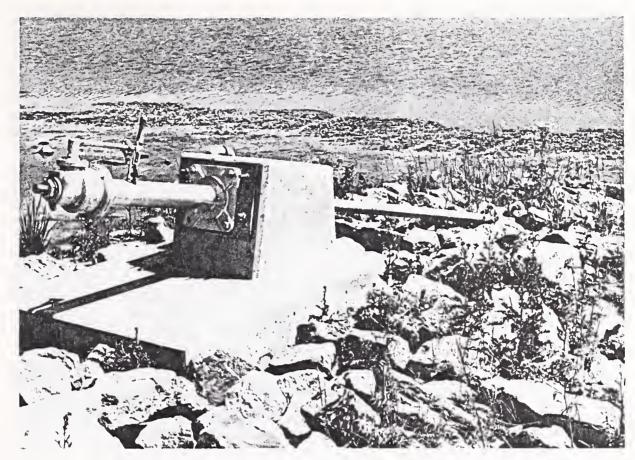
Manual operator for low-level outlet. Also shown are the gate stem, air vent, and concrete pedestal.
